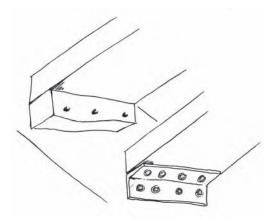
Metal and timber mounting blocks fixed to the stringer to support the treads
